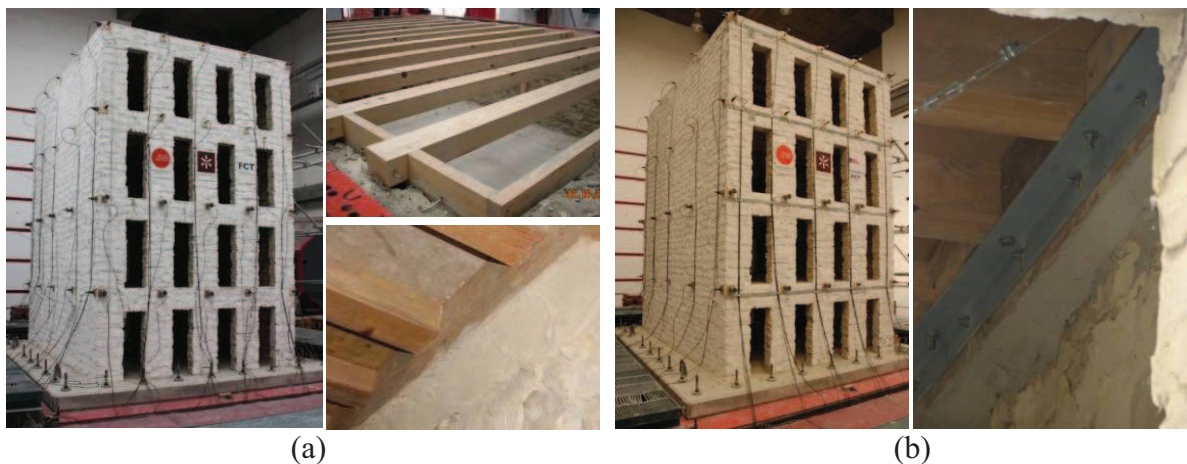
Non-strengthened (a) and strengthened (b) mock-up
